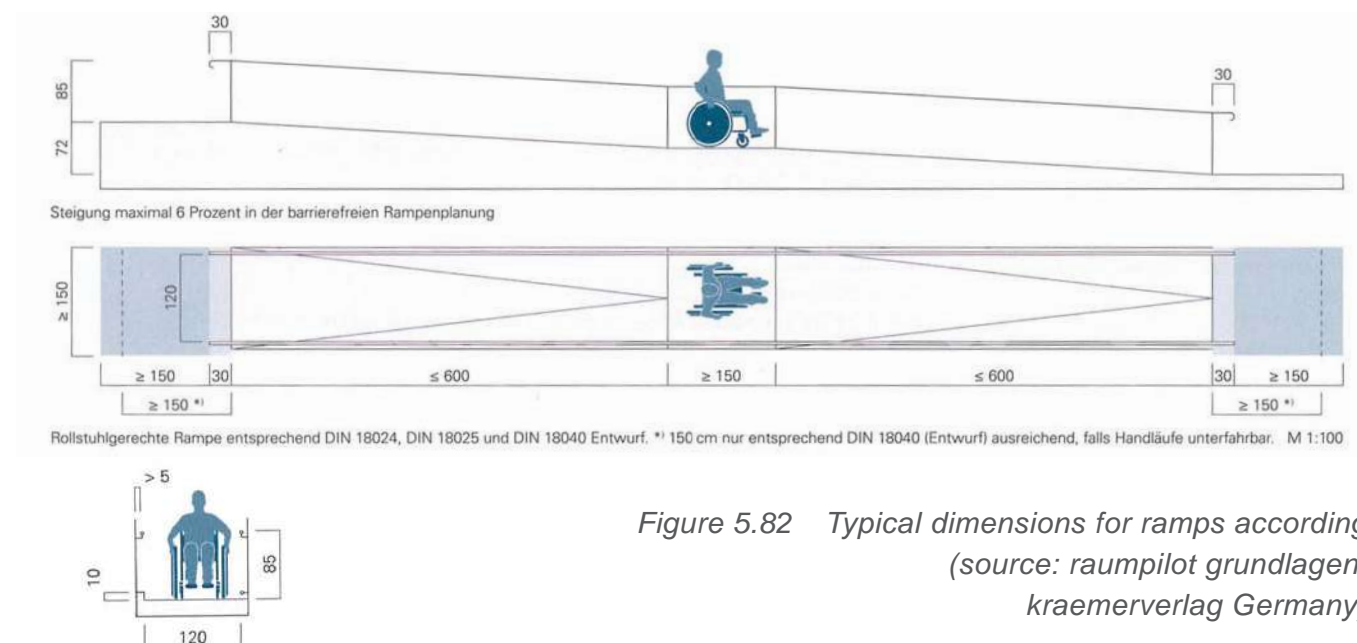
Typical dimensions for ramps according (source: raumpilot grundlagen, kraemerverlag Germany)
